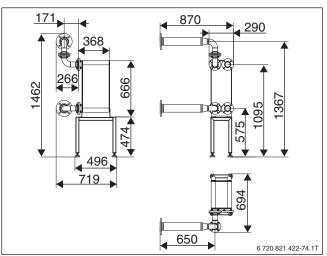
Heat exchanger assembly for 2-boiler cascade 2 × 250 kW
